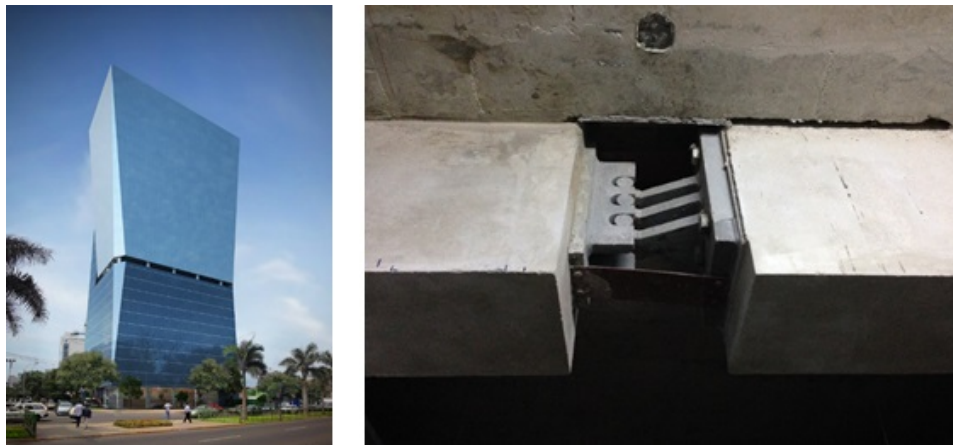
“Orquídeas Tower” building in Lima, Peru
